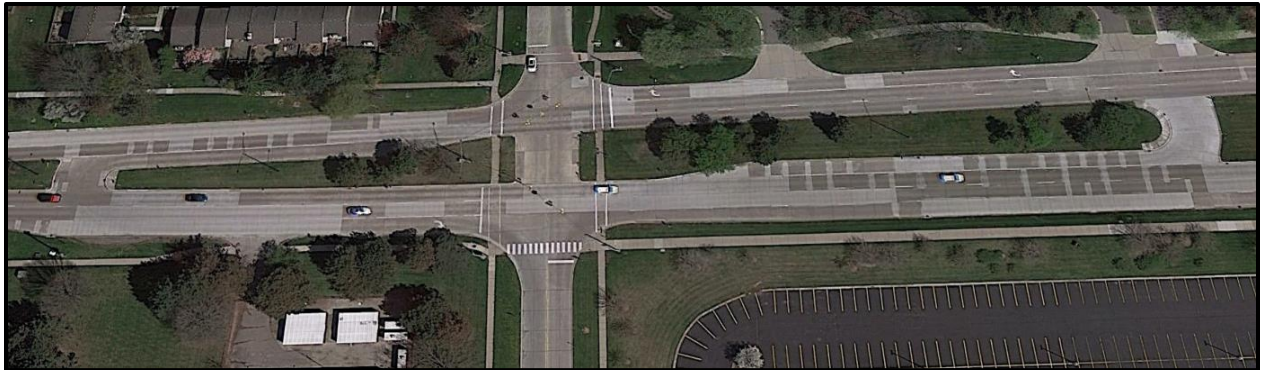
Restricted Crossing U-Turn Intersection, Intersection of West Long Lake Road and Northfield Parkway, Troy, MI (Source: Google Earth, 2022)
